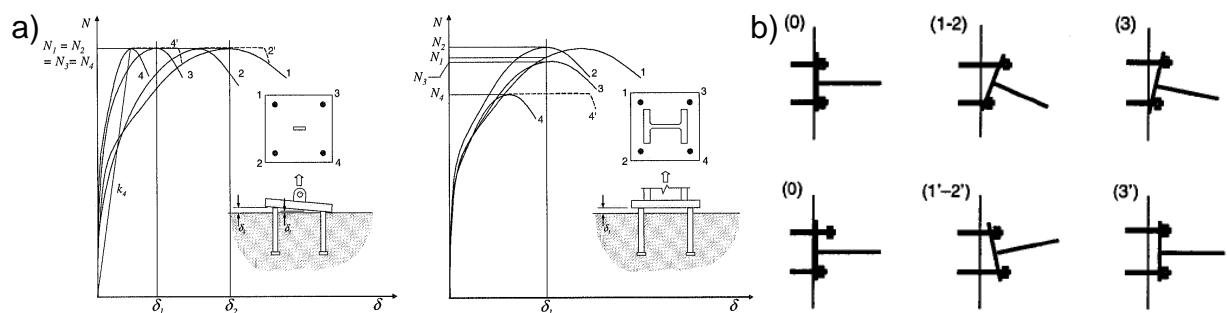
a) Ductility demand in case of anchor groups (*Silva, J.; Eligehausen, R. et al. (2006)*); b) Failure mechanism of a typical anchor connection (*Nuti, C.; Santini, S. (2008)*)
